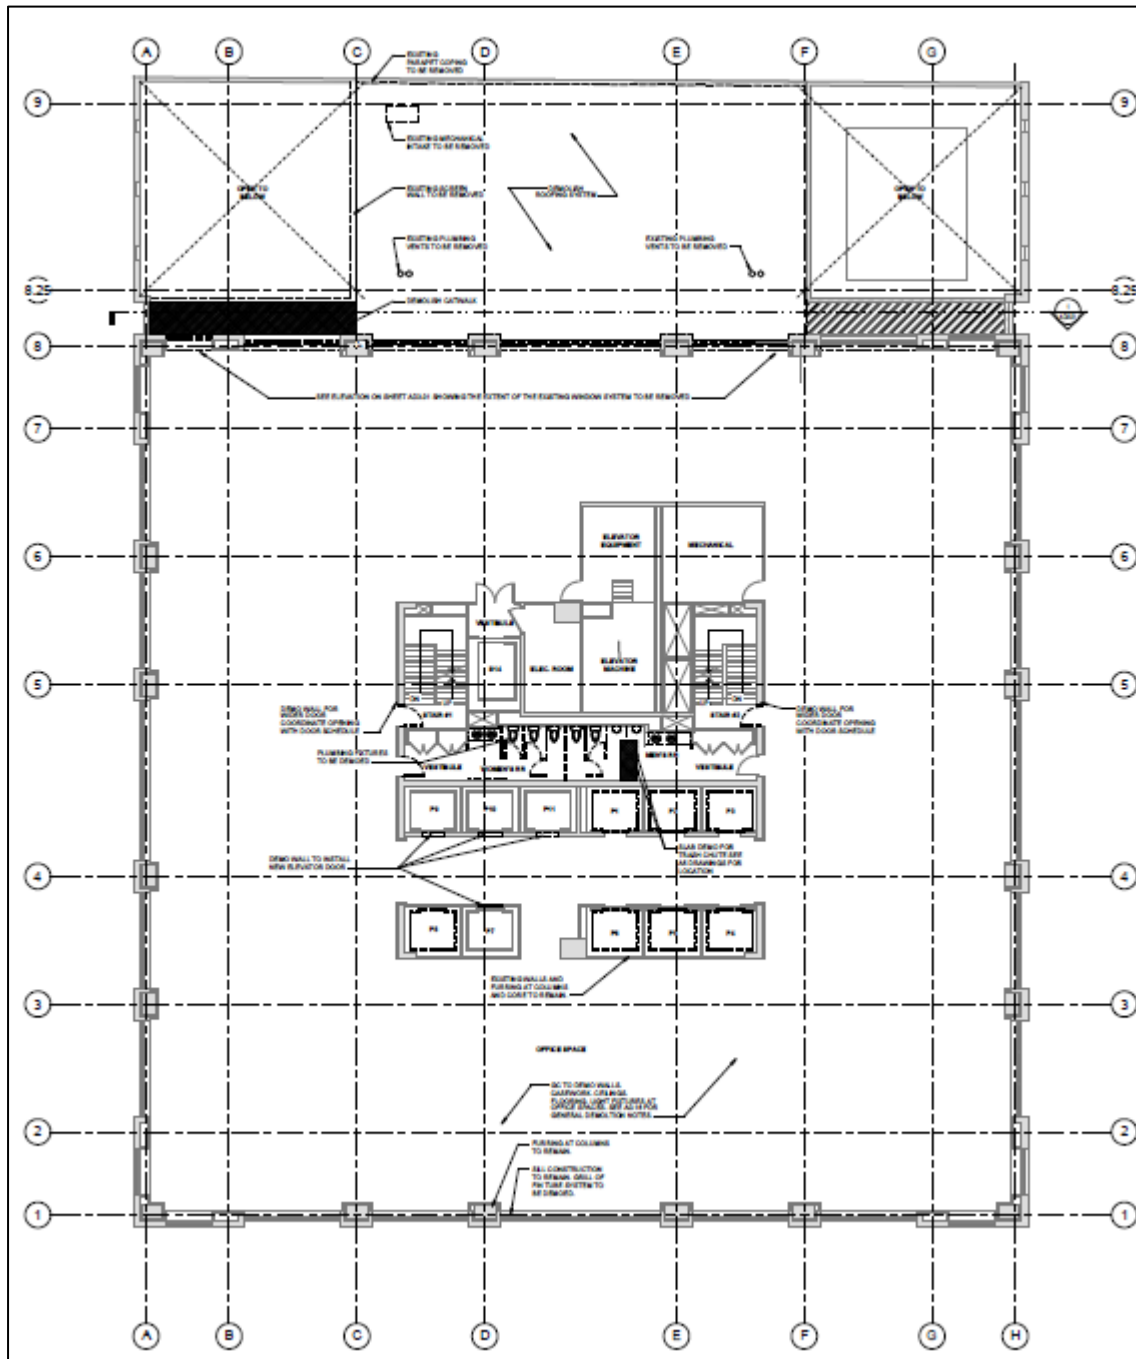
The existing 11th floor plan, showing the roof of the garage between the two cooling towers. Sheet AD2.11, 2024, SCB Architects.
